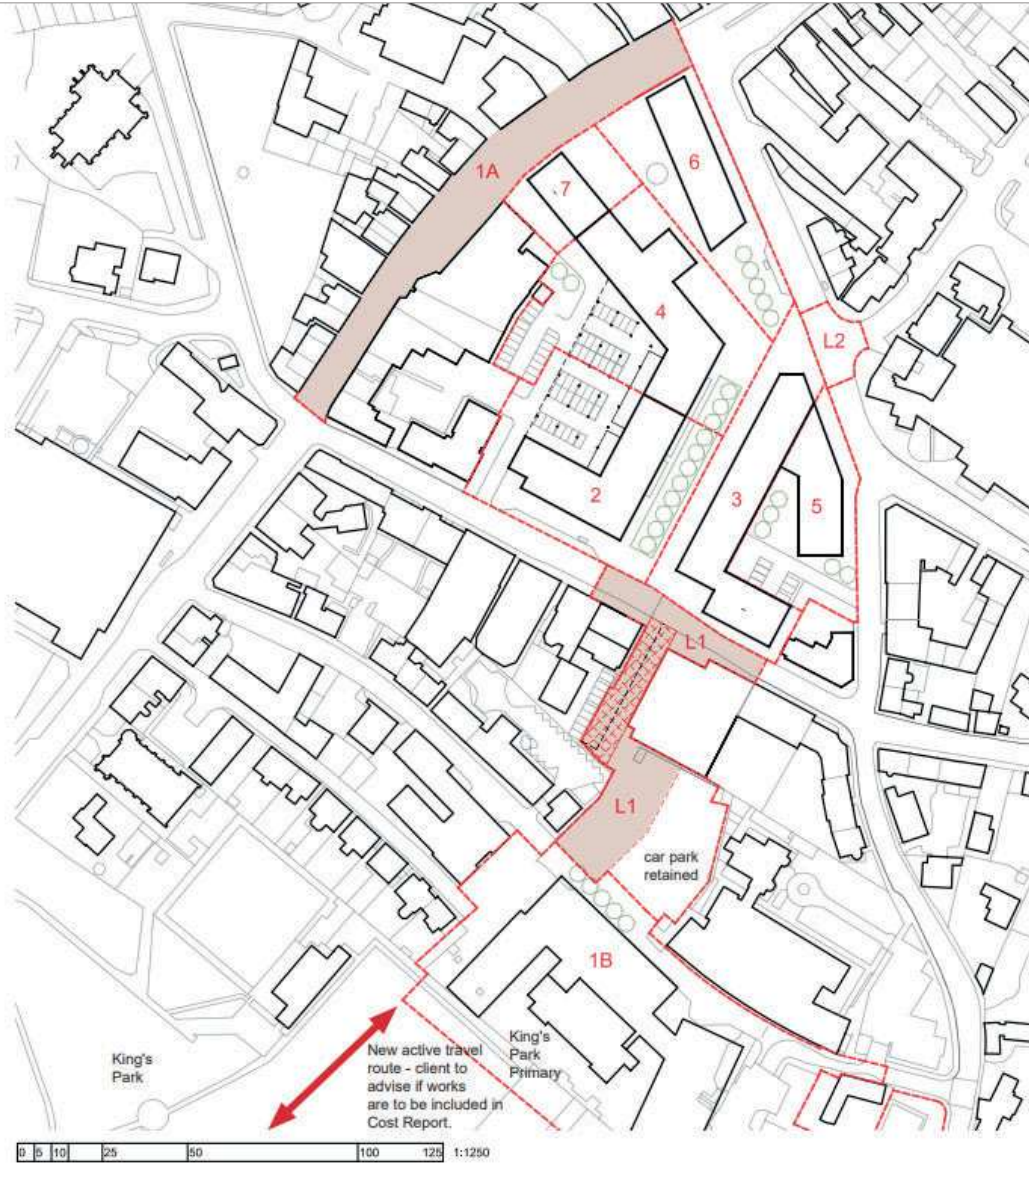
Location plan of traffic calming measures within town centre (© Reich & Hall)
